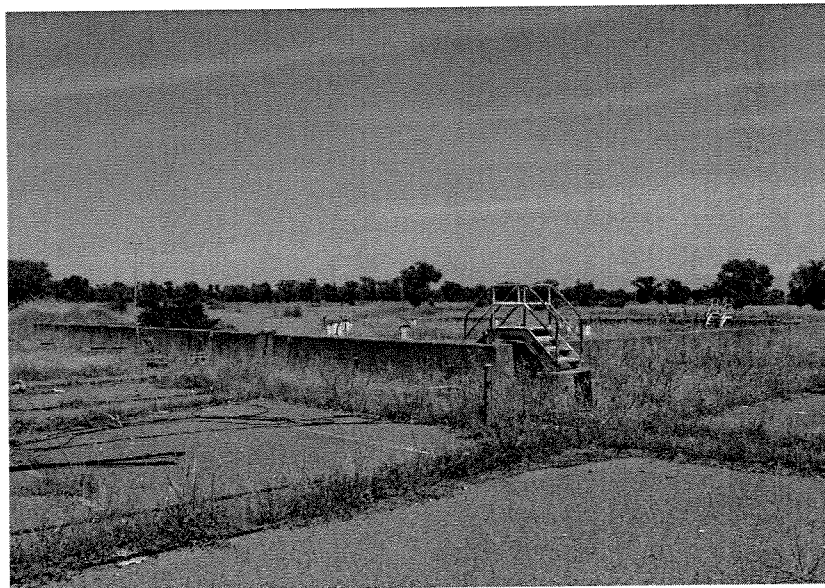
Liquid Hydrogen Tank at Test Stand No. 3 (Unit 136), foundation remnants, Beta Test Complex, 1963-1964. Looking northeast. View of May 2005.
